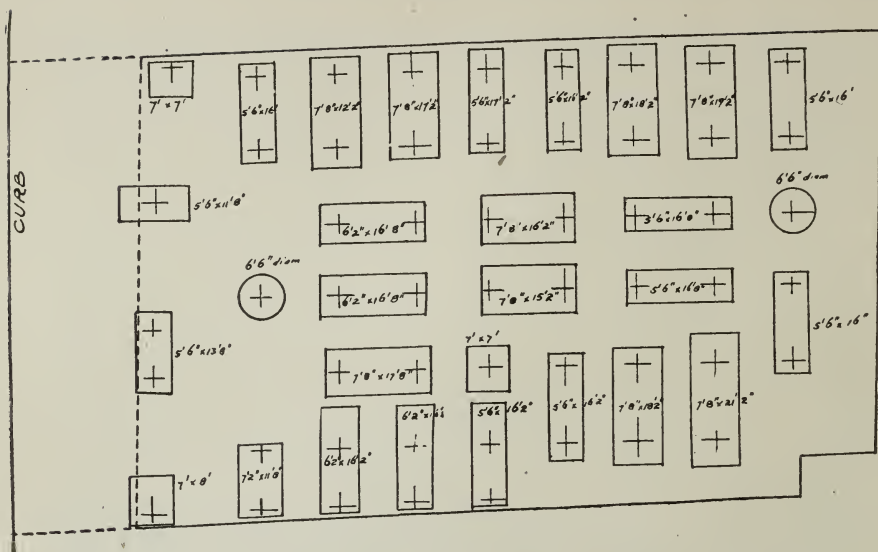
Plan of Caisson and Pier Foundation, Singer Building, New York.
